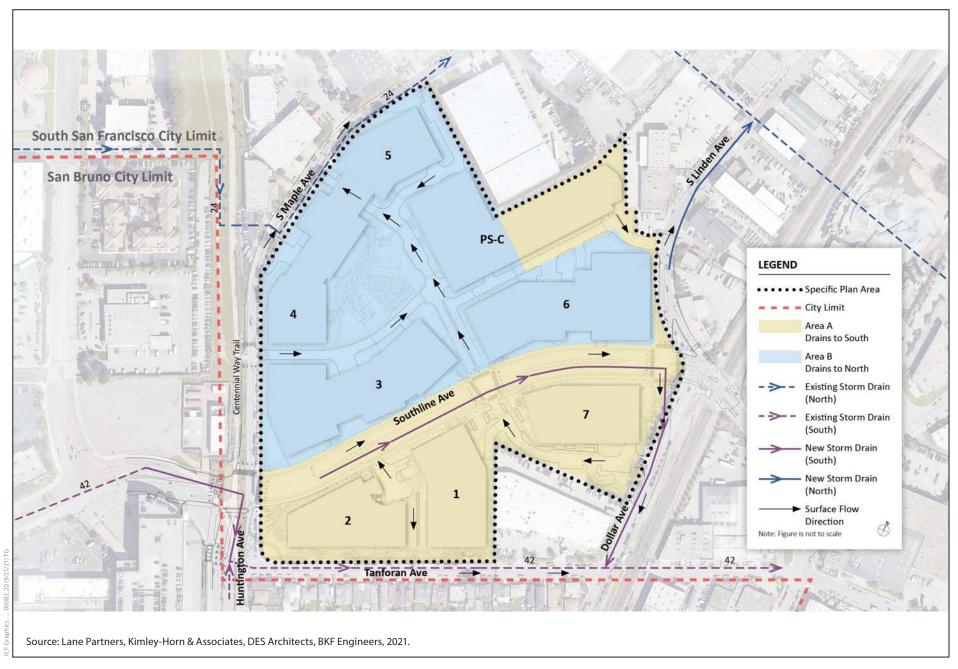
Existing and Proposed Storm Drain Infrastructure
